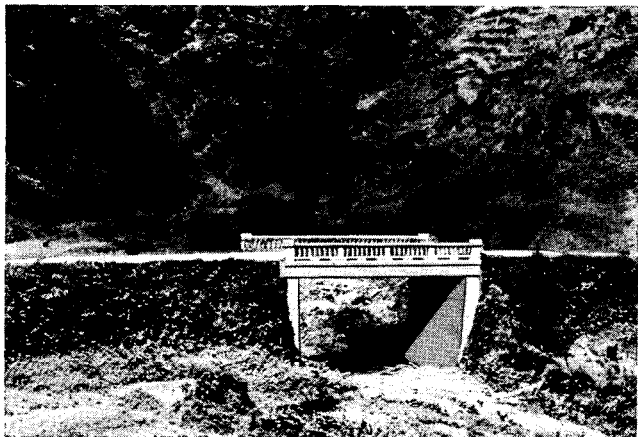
Simple stringer bridge with steel I-beams and timber flooring.
